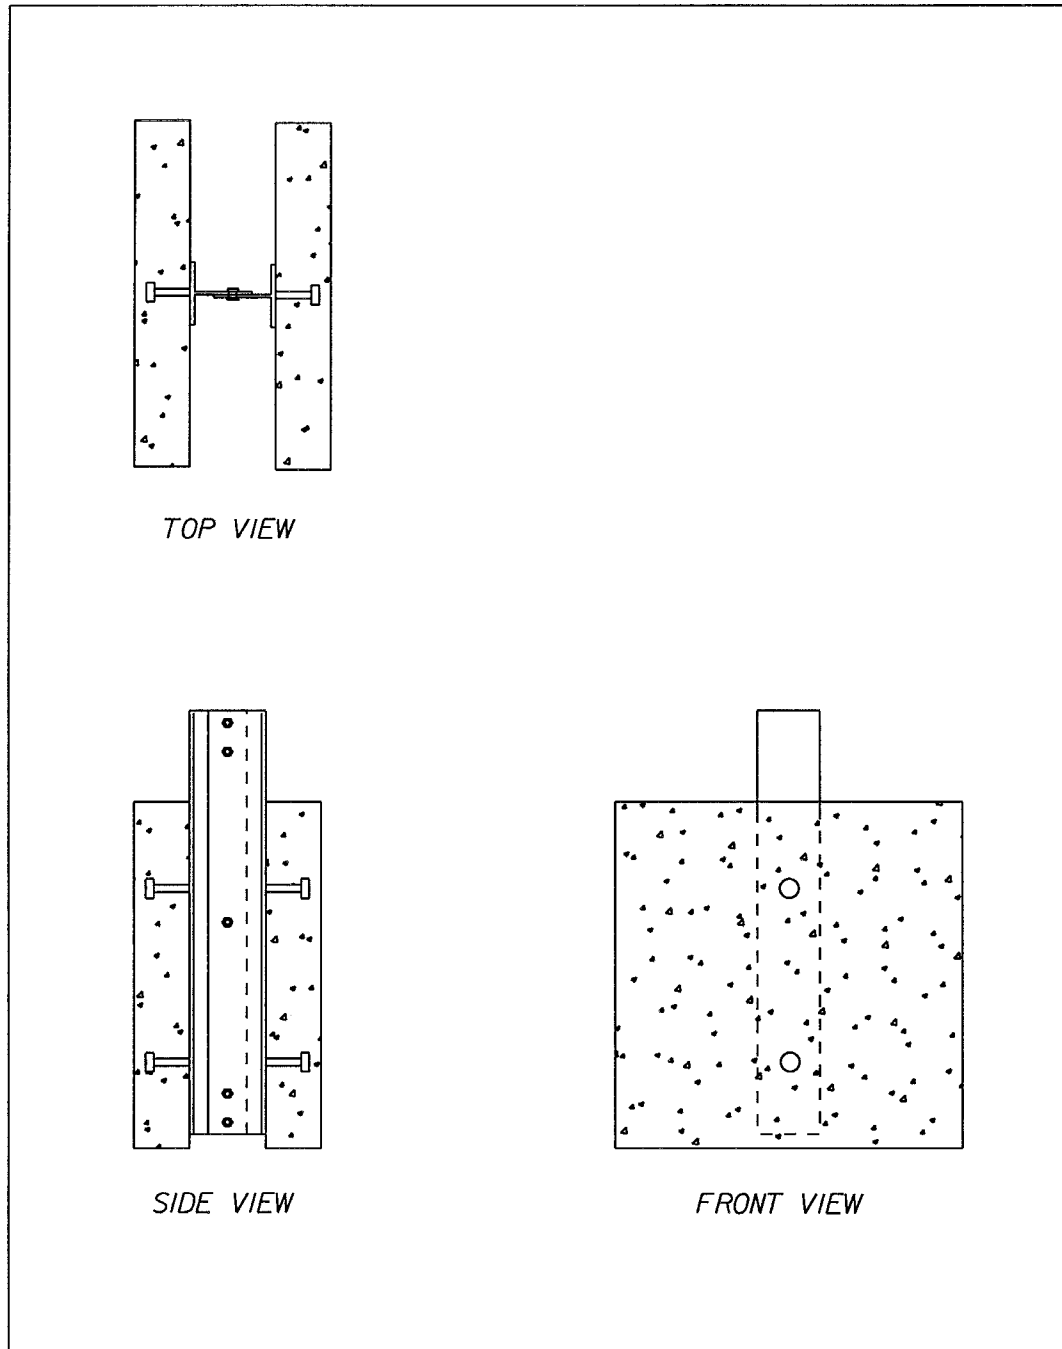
Solid Slab Push-Out Specimen with Studs Welded Centrally on Flange (Reinforcing steel not shown)
